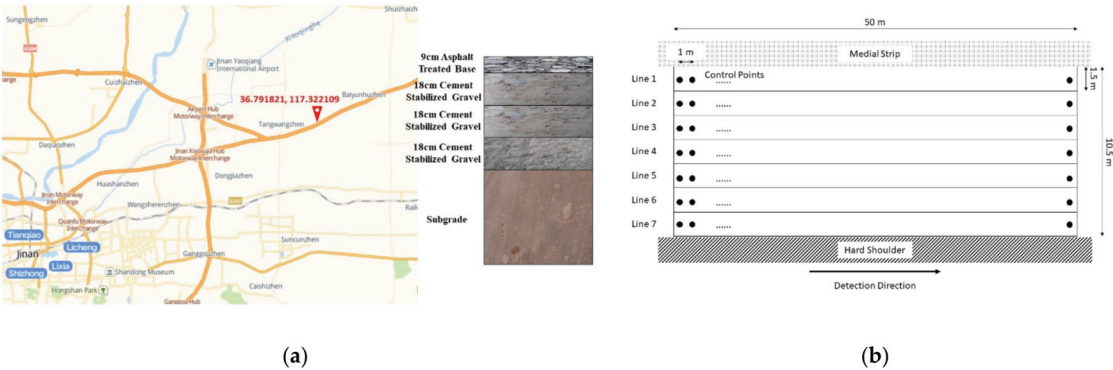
Location and pavement structure of the field test. (a) Location and structure; (b) Test area.
